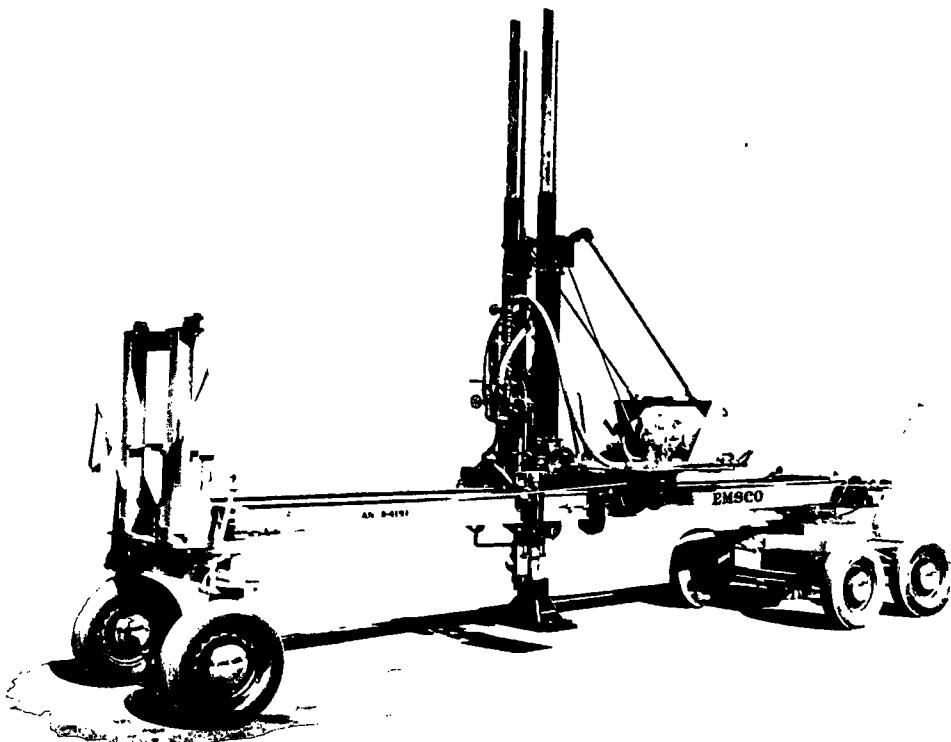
Pneumatic-driven pavement breaker fitted on unit for compacting backfill in wide trenches.
